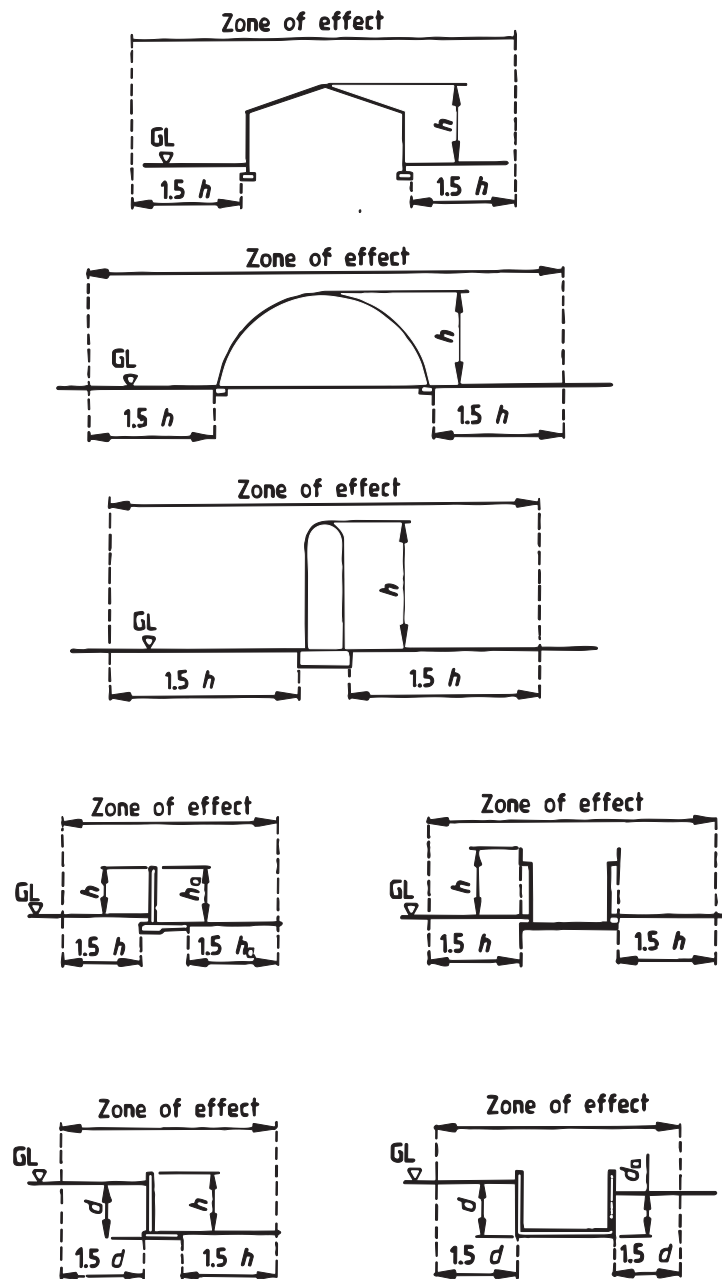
Examples of zone of effect for retaining structures or buildings containing a retaining element
